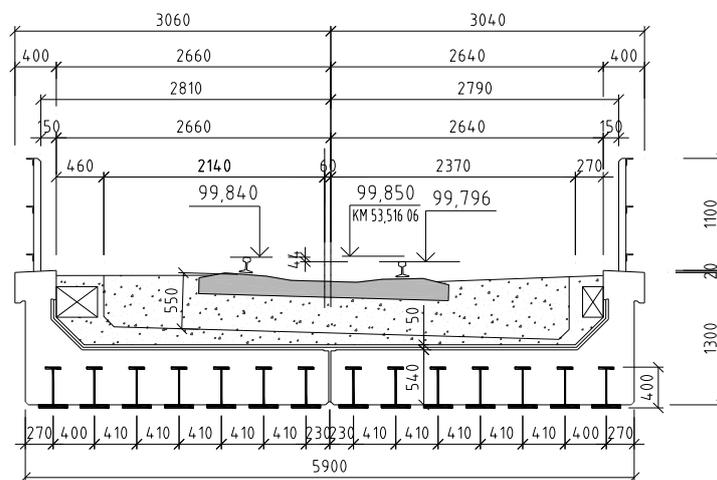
Cross-profile of the Kraľovany–Trstená railway deck bridge
